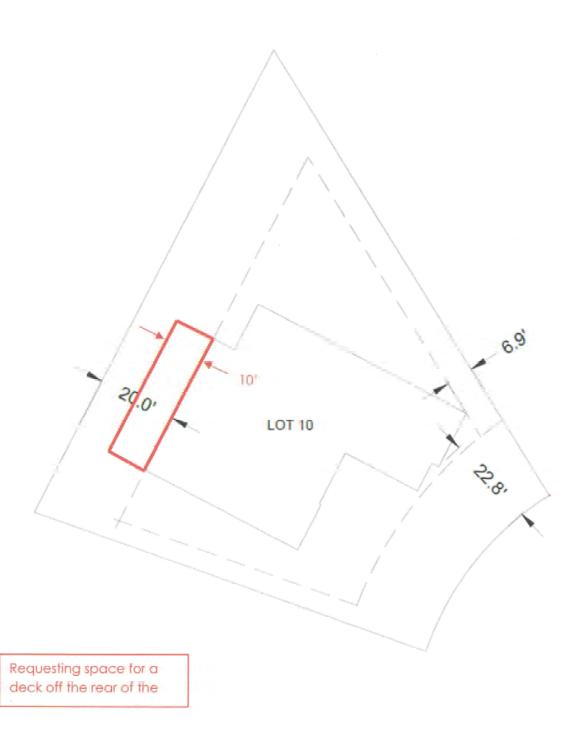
with Hawthorne GARAGE Hawthorne Floor Plan LOT 10 Currently, no space for a deck off the rear of the
